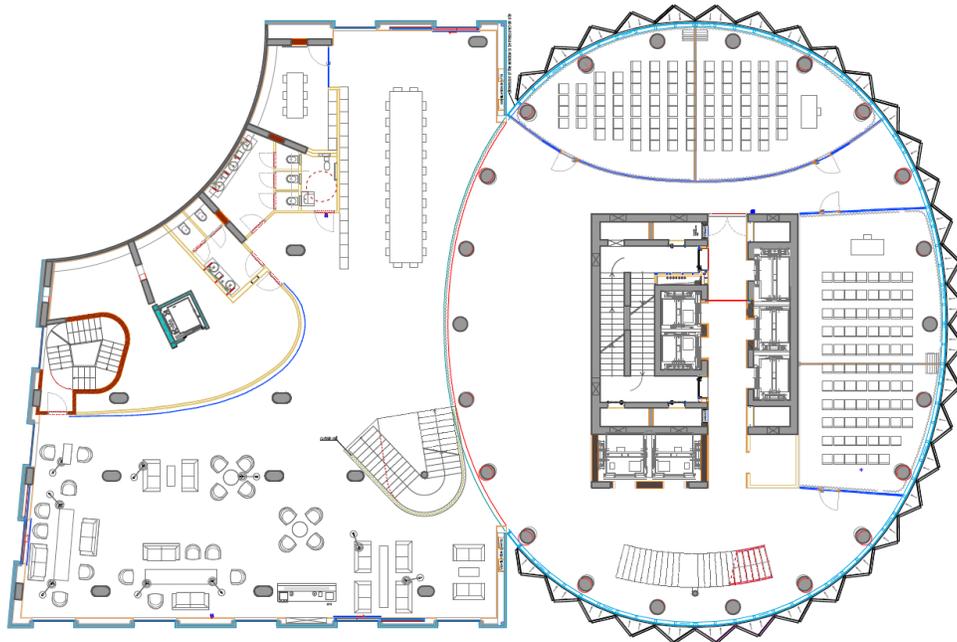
First Floor Plan Layout (Lounge, Business Corner, Meeting Rooms)
